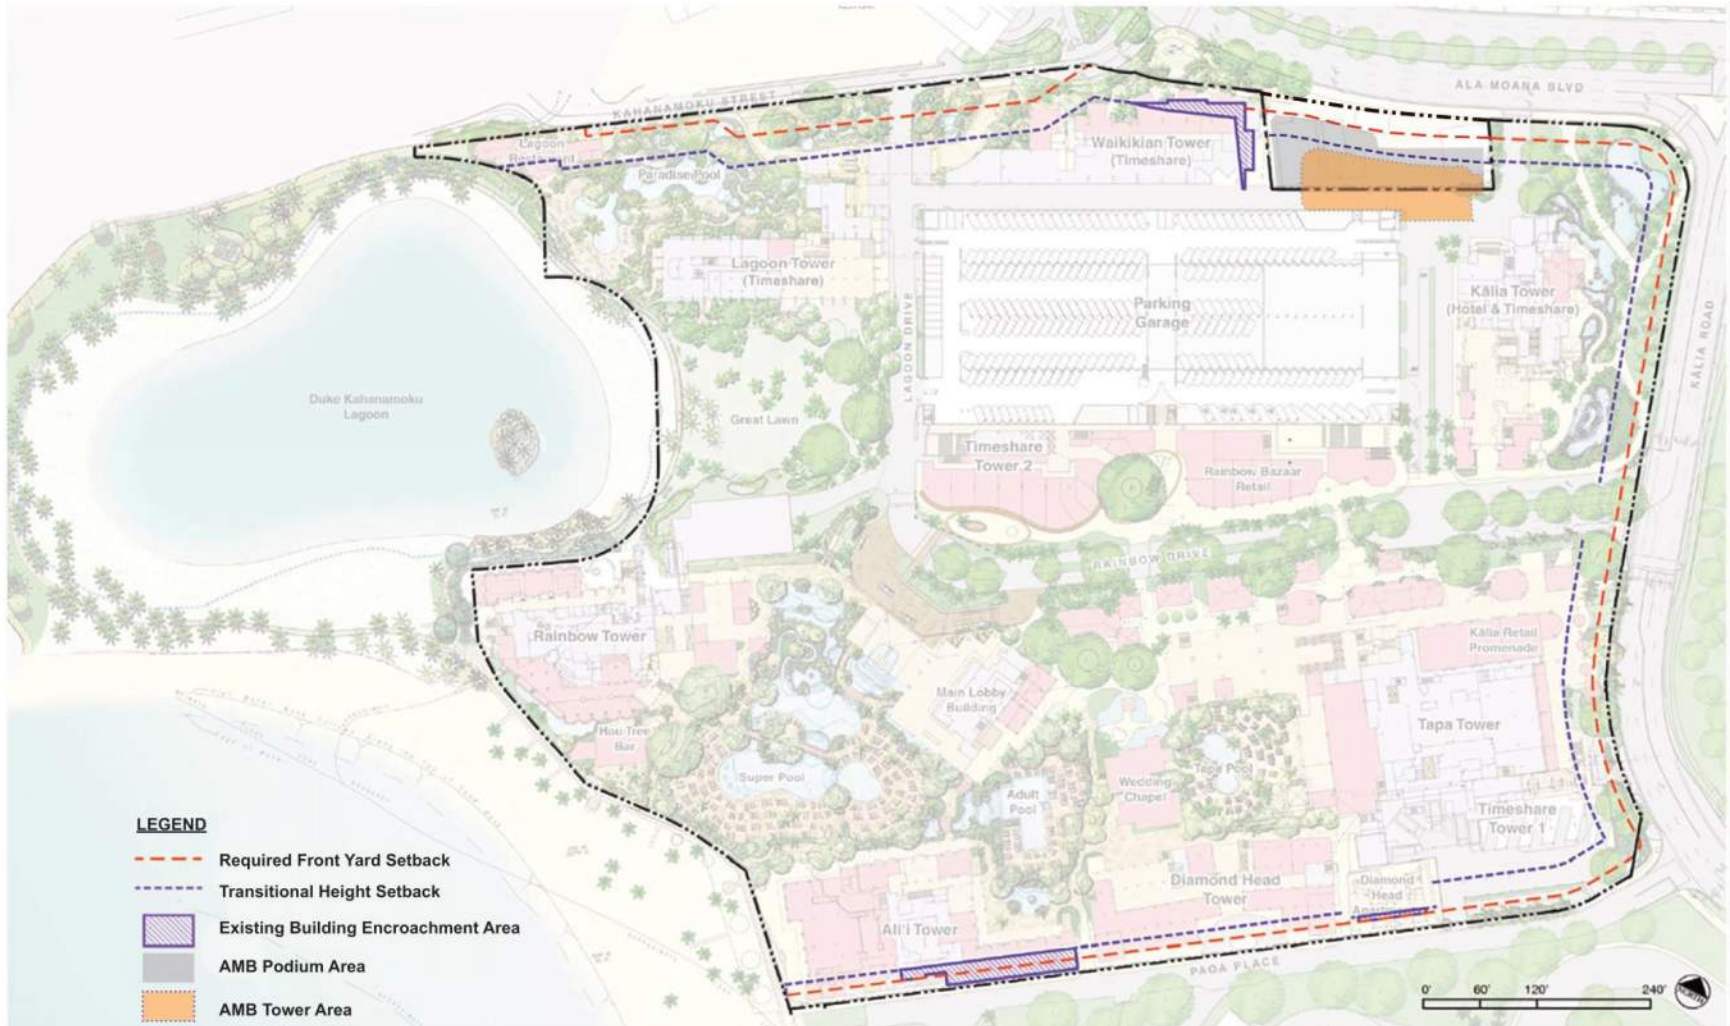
Existing and Proposed Transitional Height Setbacks and Building Encroachment
